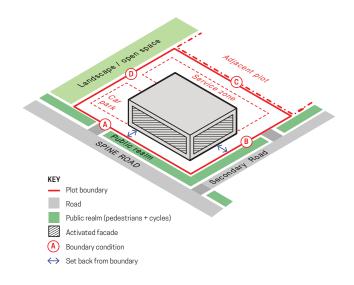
Buildings on gateway plots should comply with set back requirements and be aligned to activate street frontages.
